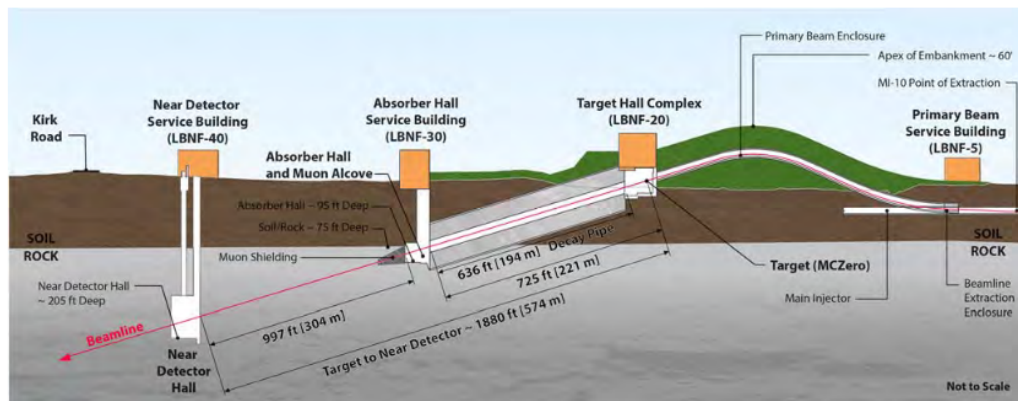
Longitudinal section of the LBNF beamline facility at Fermilab[52]
